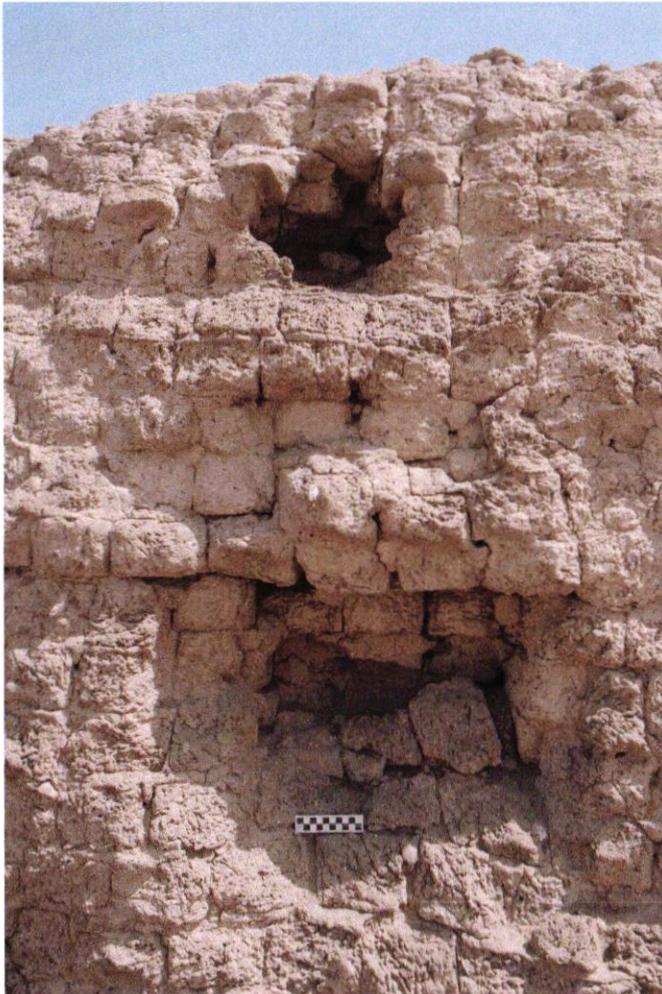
Two holes near the top of the southwest wall of the main enclosure, exterior side.
